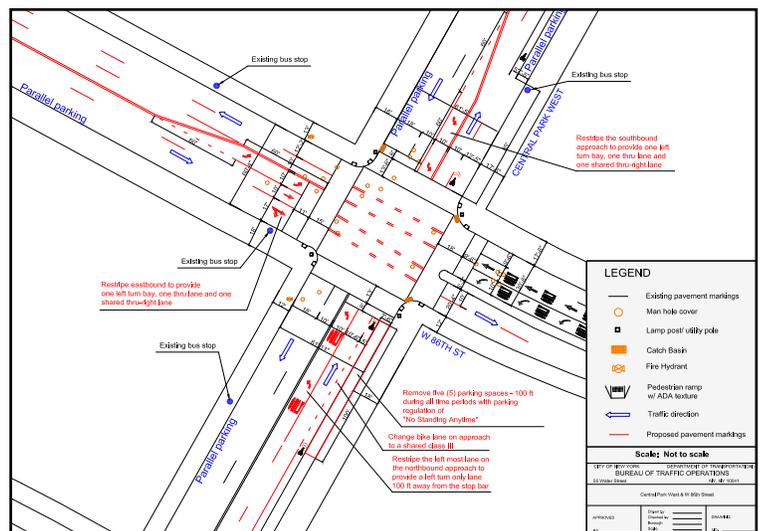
Proposed Roadway Configuration - Central Park West & West 86th Street
